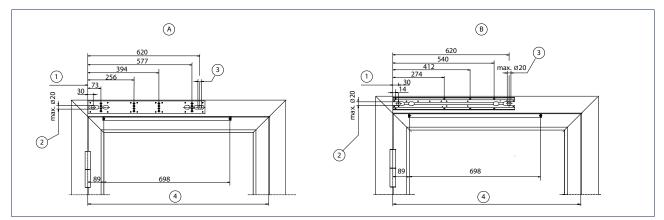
ep01 Door overlap (max.) 30 mm Door opening angle (max.) 105°
